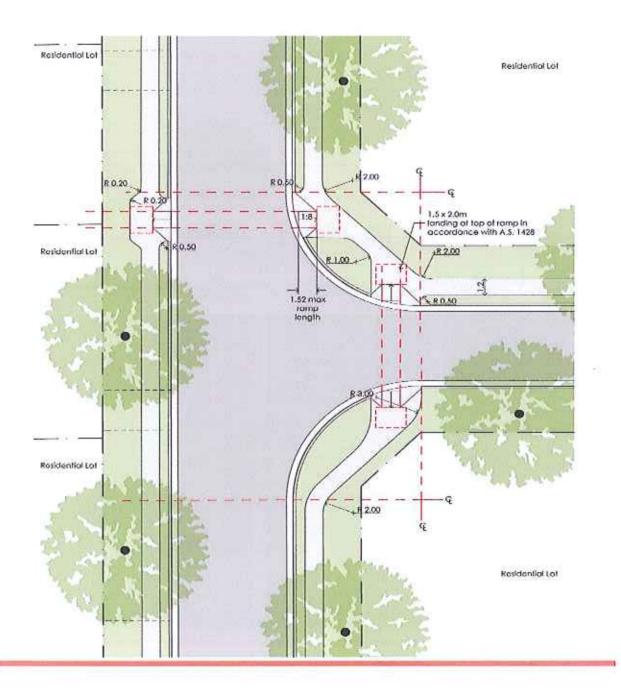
Pedestrian Pathways & Pram Ramps - Typical
